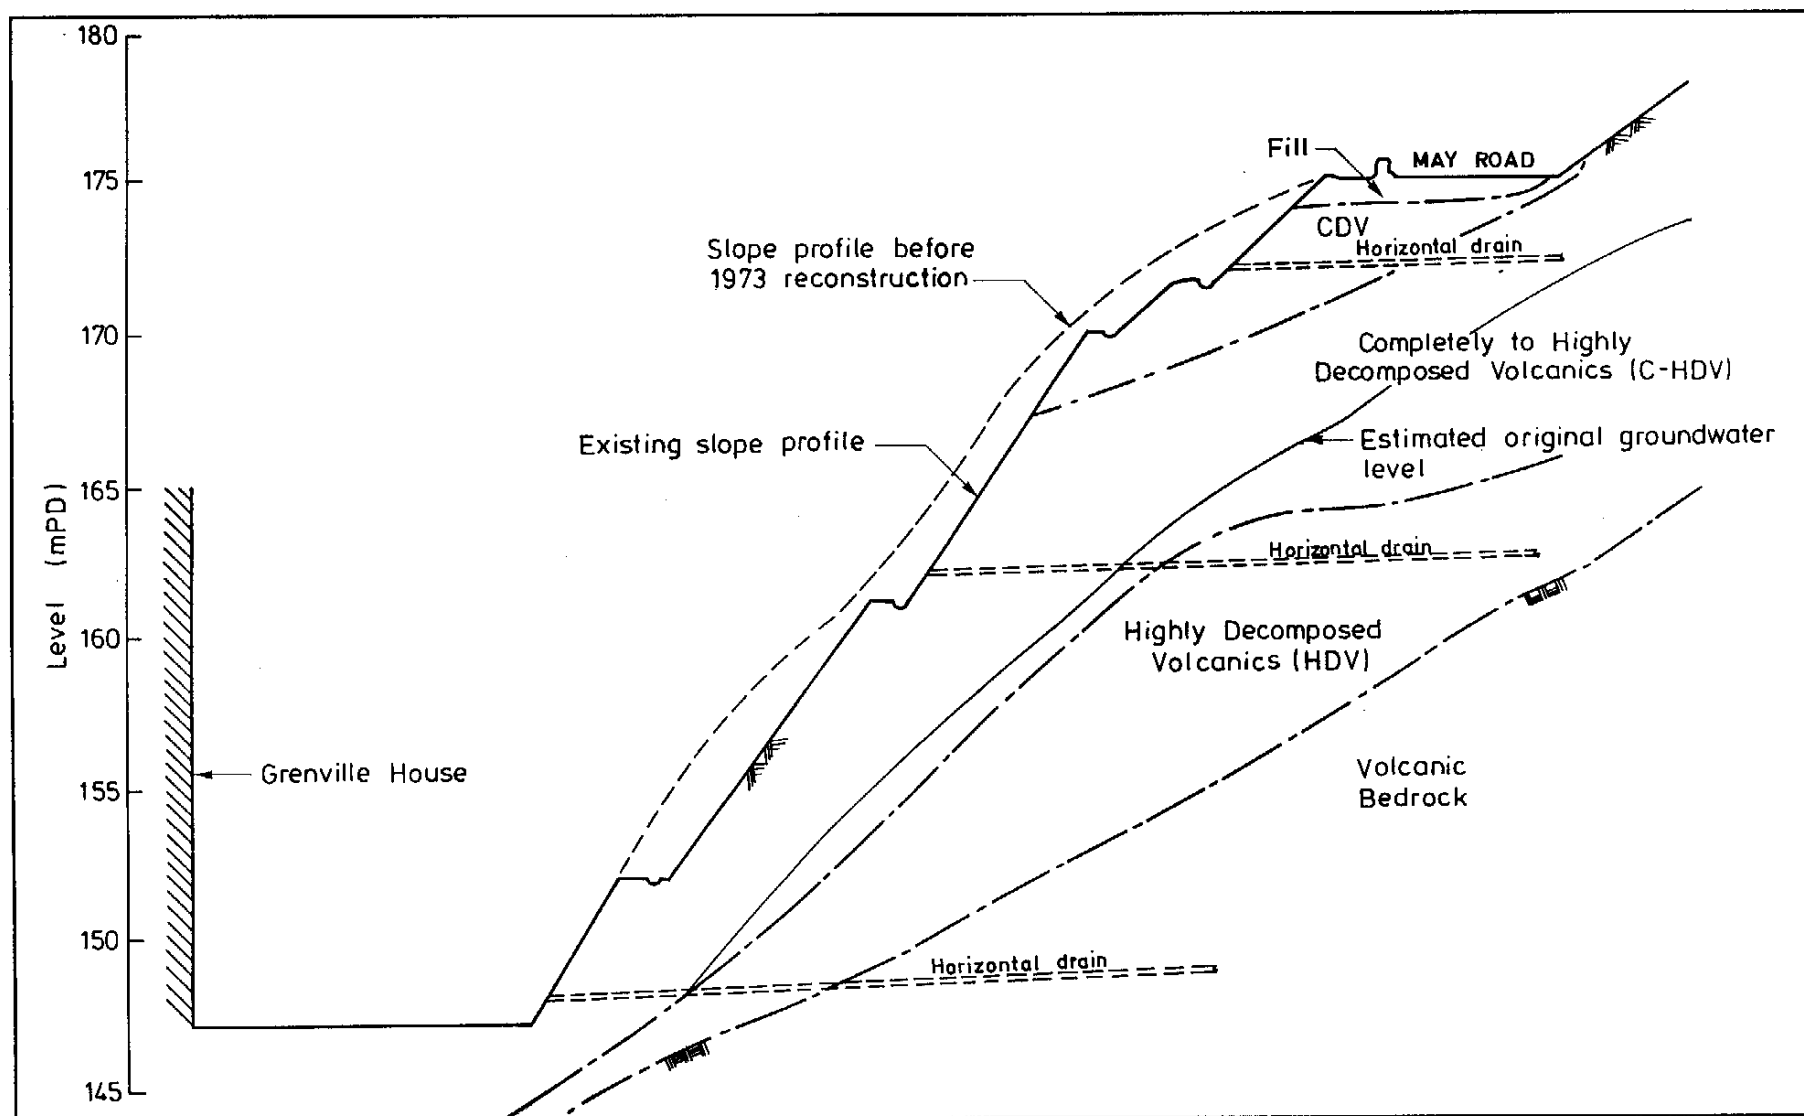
Typical Section Showing Ground Conditions and Positions of Horizontal Drains Behind Grenville House (after Tong & Maher, 1975 and Mak & Shelton, 1985)
